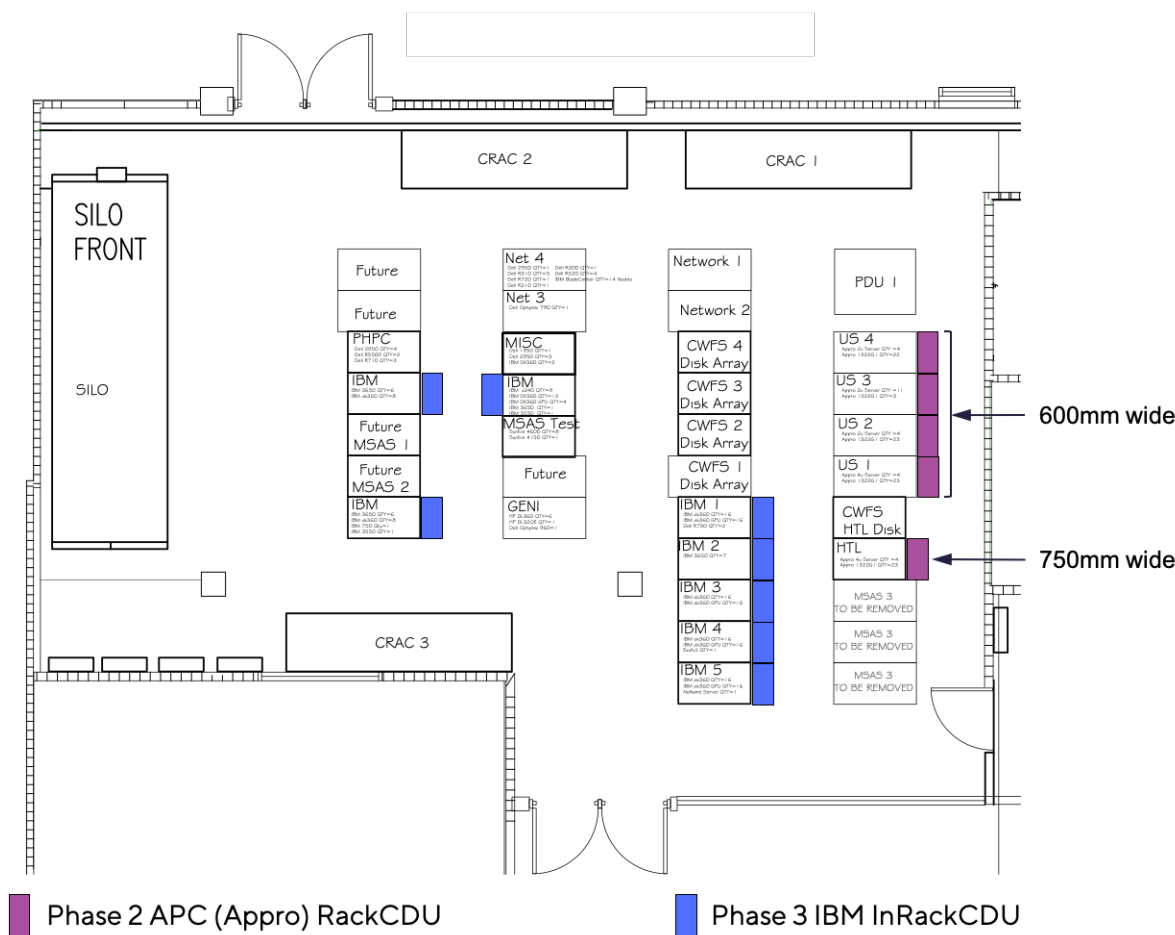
ARL ‘White Cell’ Data Hall Floor Plan
